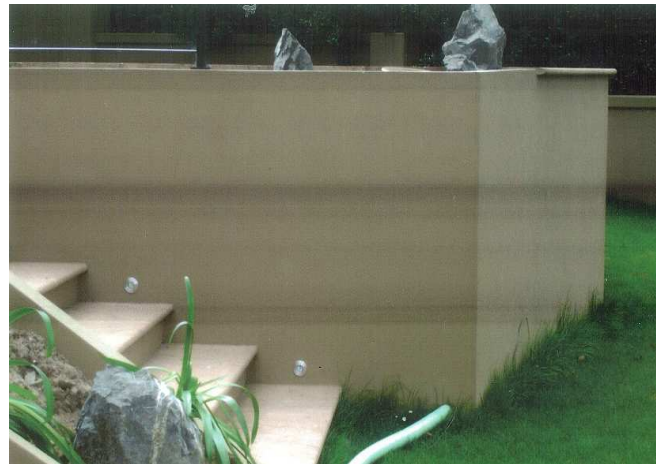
the swimming pool wall beside steps from the terrace to ground level
